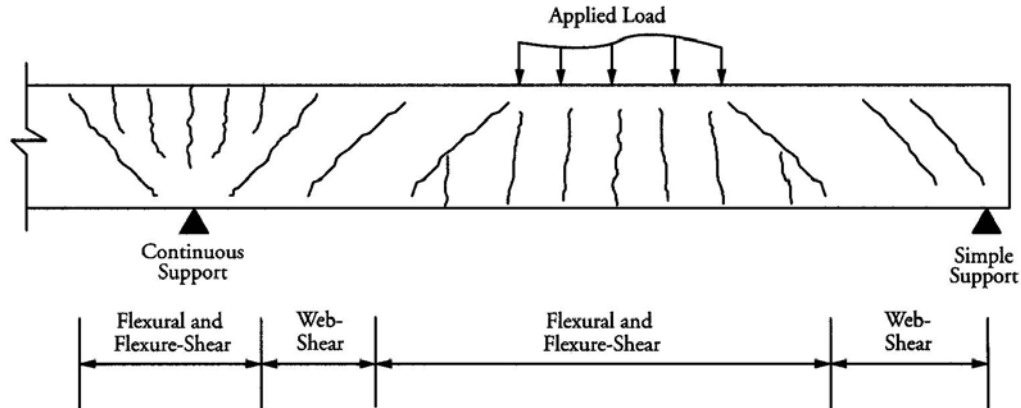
(Figure 8.4.1-) Types of Cracking in Concrete Beams
